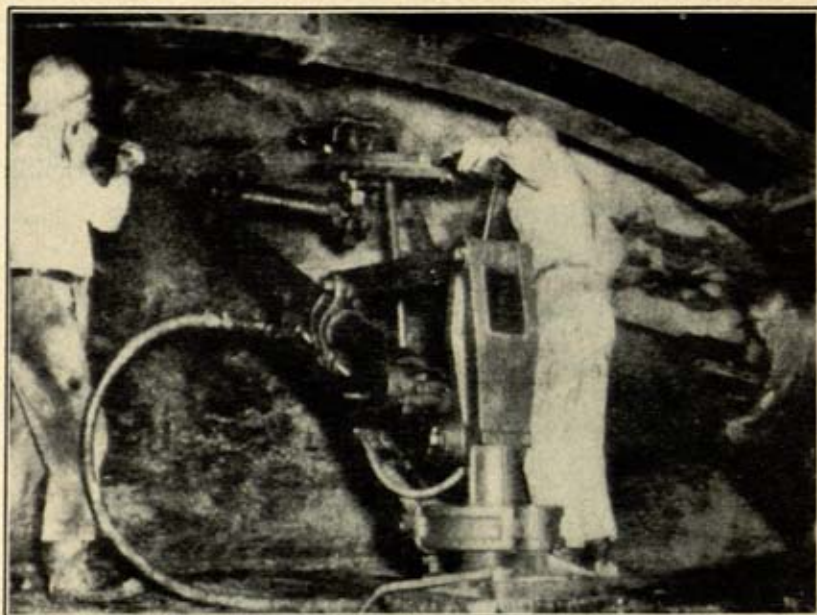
Drill mounted on a powered boom. (*Ingersoll-Rand Co.*)
